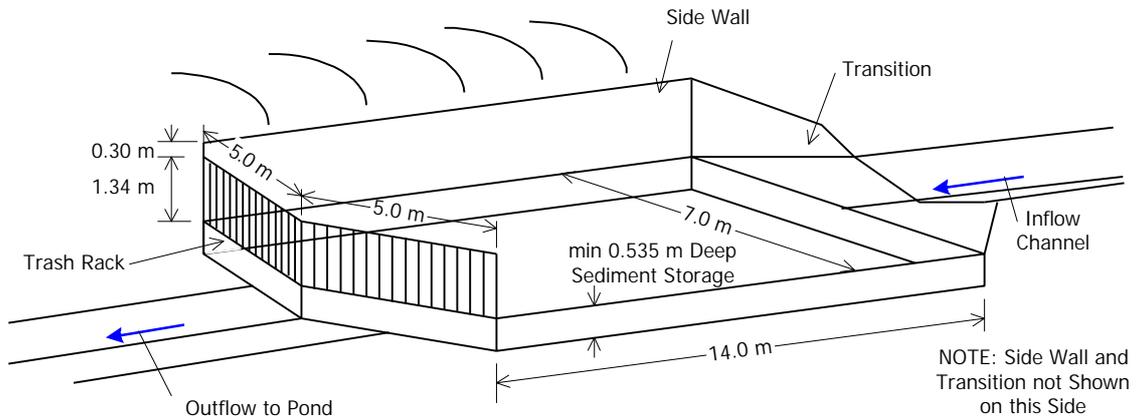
D1 Diagrammatic Layout of Proposed Type 1 SBTR Trap for Sg. Rokam example
